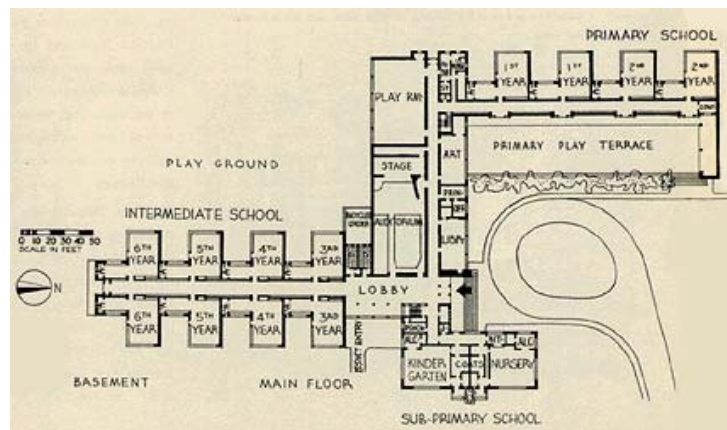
Crow Island School, Winnetka, Ill. Floor Plan.³
